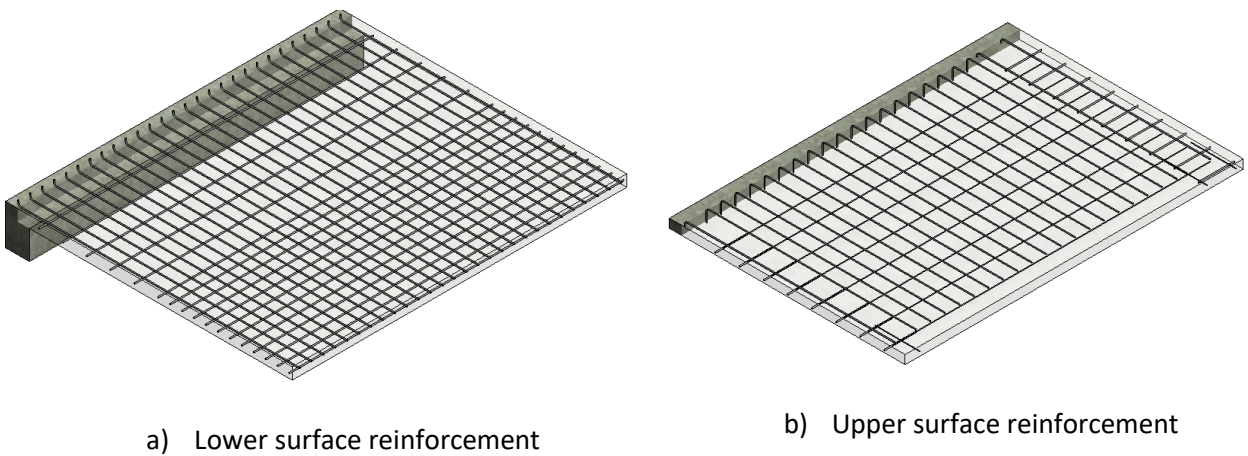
Area section view of lower and upper reinforcement of the fixed edge strip of panel B
